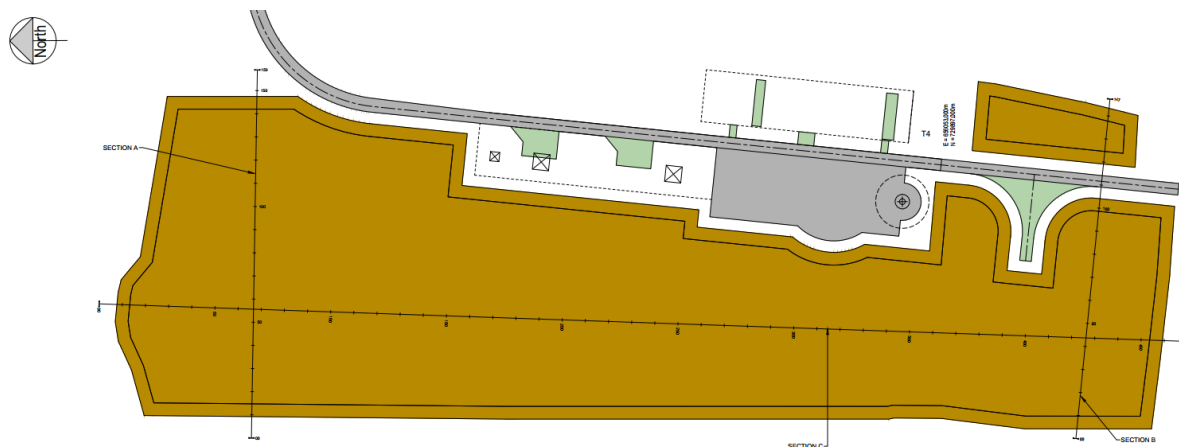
Spoil Deposition Area at T4. Excerpt from Planning Drawing 23882-MWP-00-00-DR-C-5035
